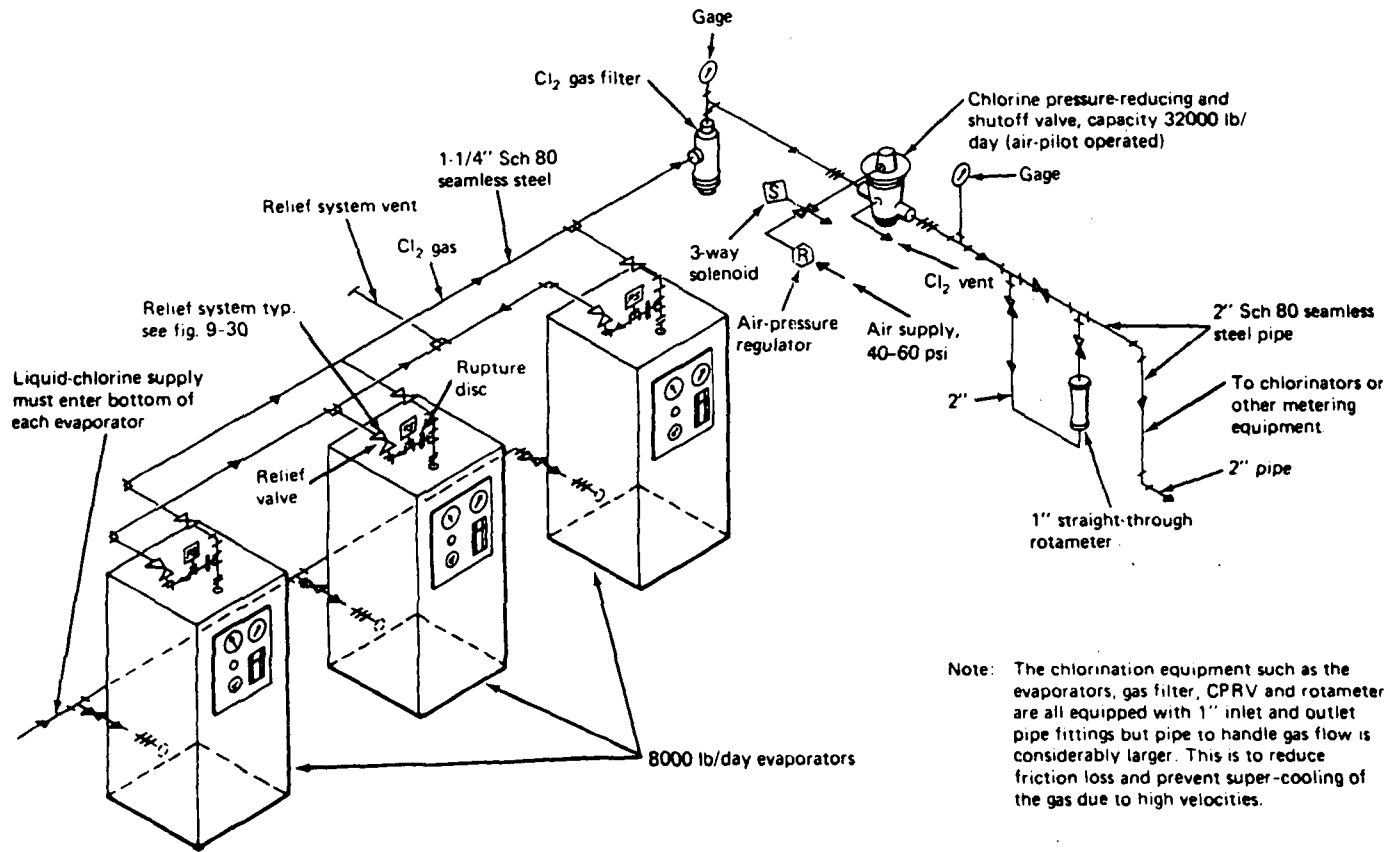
Manifold chlorine evaporators. The chlorination equipment, such as the evaporators, gas filter, CPRV, and rotameter, is all equipped with 1-in. inlet and outlet pipe fittings, but pipe to handle gas flow is considerably larger. This is to reduce friction loss and prevent super-cooling of the gas owing to high velocities.
